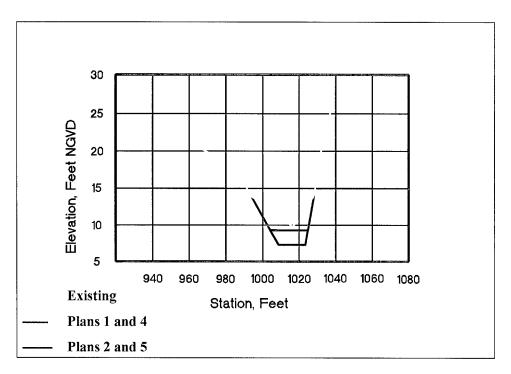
Type 1 and Type 2 upstream sediment basin cross section at Station 377+61
